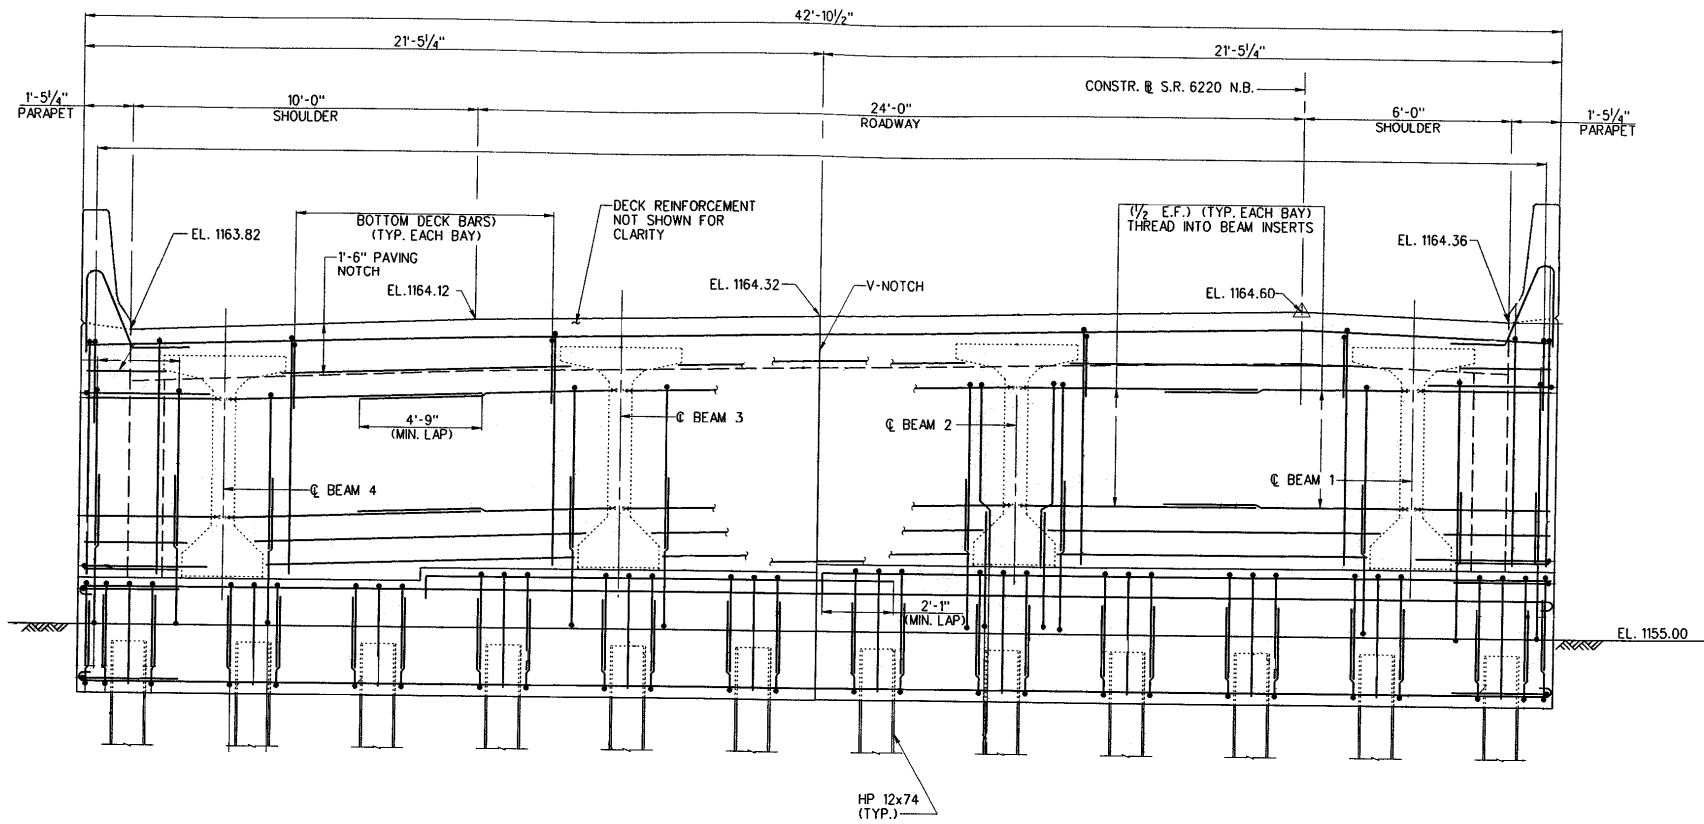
Elevation of Bridge 109 Abutment 1.
